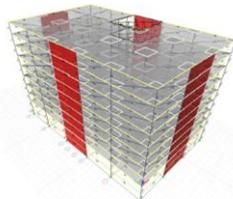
Model 2: 3D view of Flat slab structure with shear wall provided at edge
